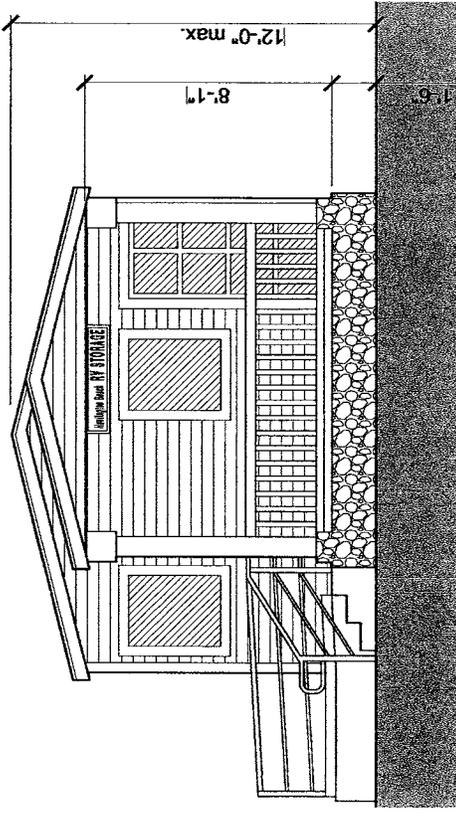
Proposed Building Elevations (RV Storage Office)
